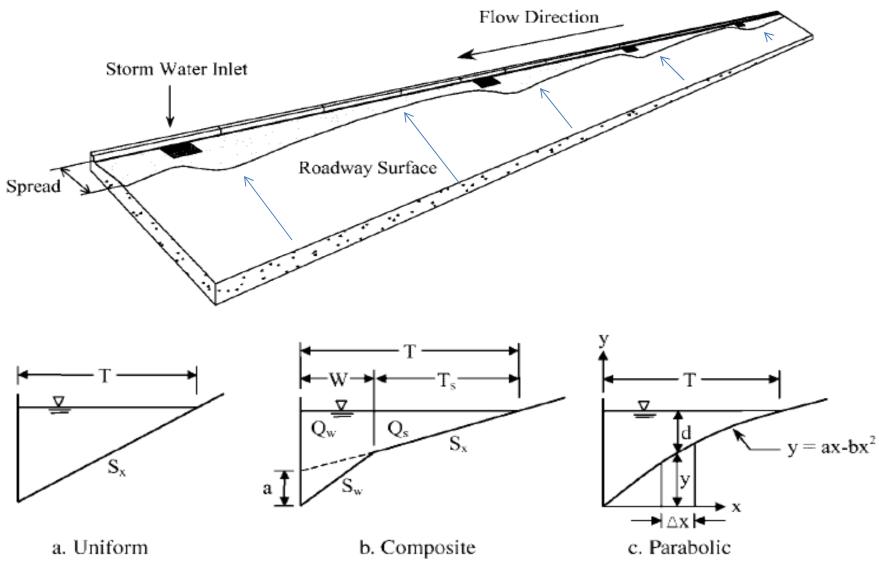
Conventional gutter sections. (Adapted from Brown et al., 1996)
